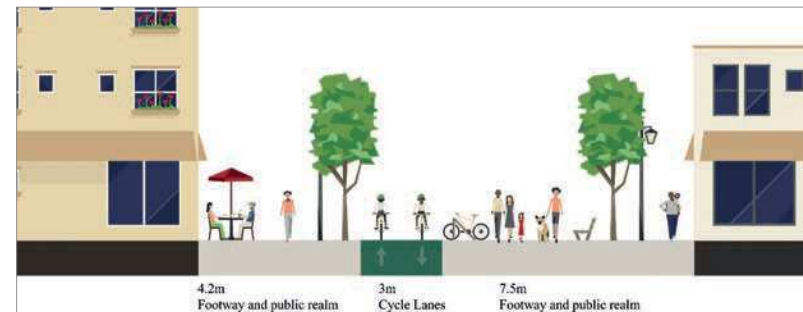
High Street Indicative Proposals (wide cross section) (© Street Mix)
